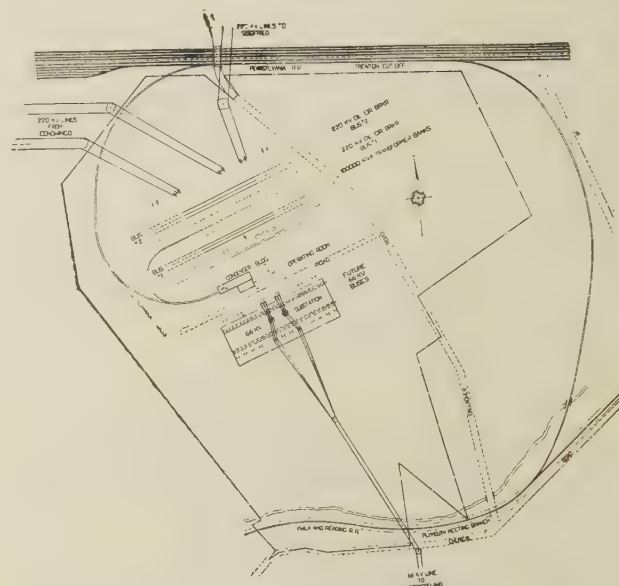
PLOT PLAN OF THE PLYMOUTH MEETING SUBSTATION
